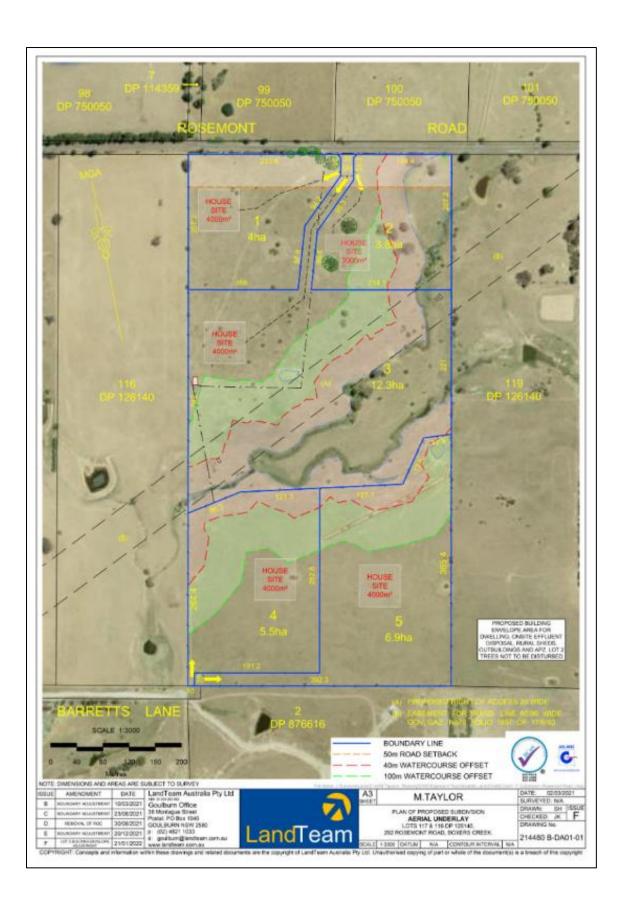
Site Plan of the Proposed Development (Land Team 2021)
